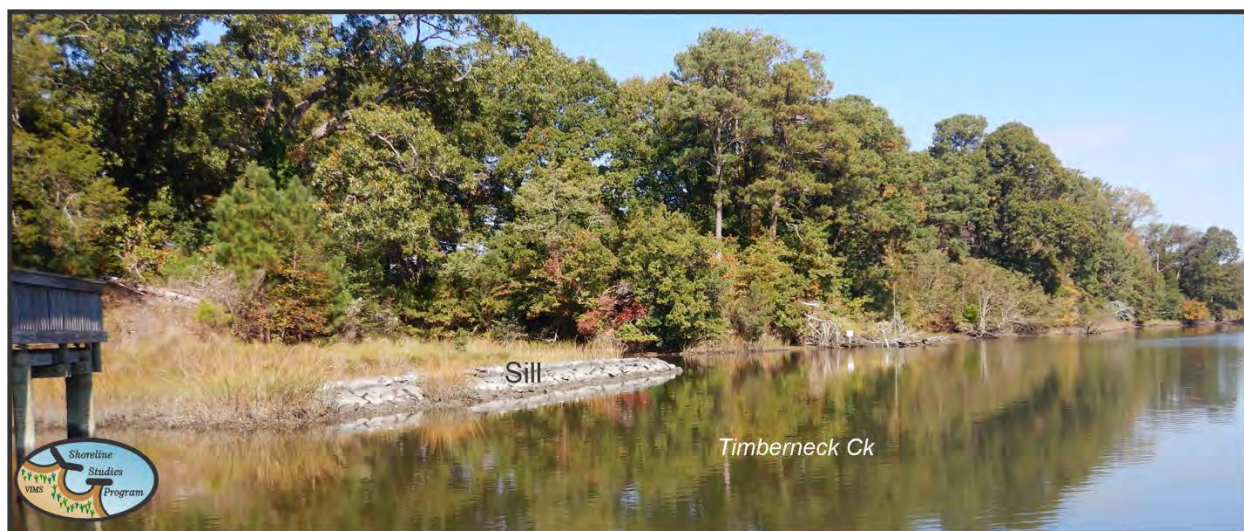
Sill constructed adjacent to the pier on Timberneck Creek. Photo Date 1 Nov 2021. Lat/long location: 37.297472°, -76.533842°
